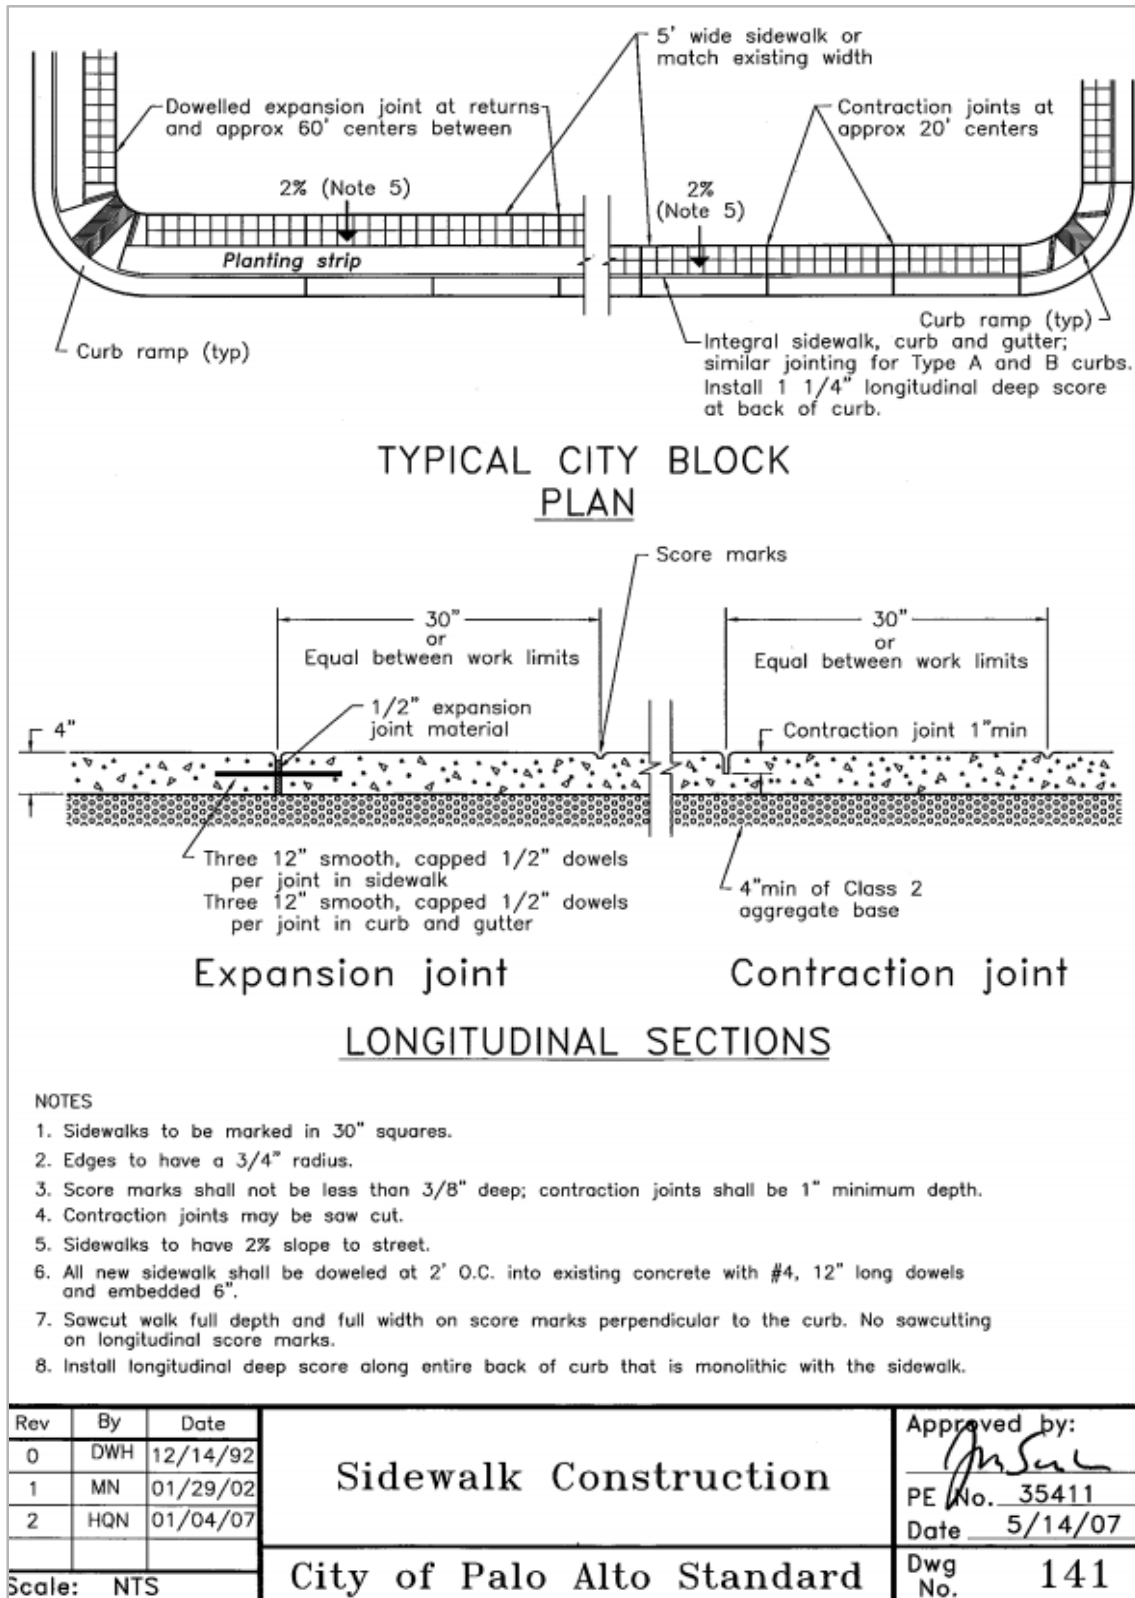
City of Palo Alto Standard Drawing for sidewalk construction.
